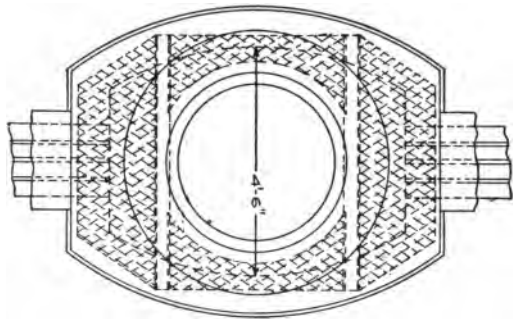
Plan and Sectional Elevation of Standard Form of Manhole Used in New York City.
